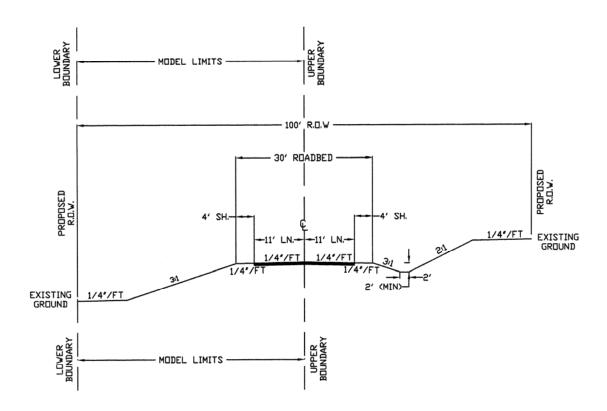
Small-Scale Erosion Control Model Typical Cross Section. (Not to Scale)
